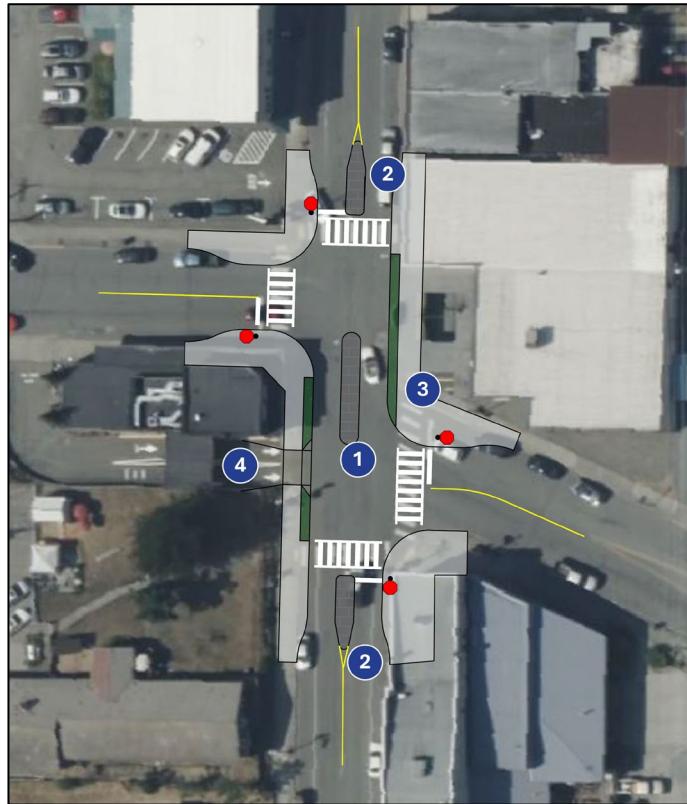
Proposed Safety Improvement Concept for Mashell Avenue and Center Street (Autocad)
